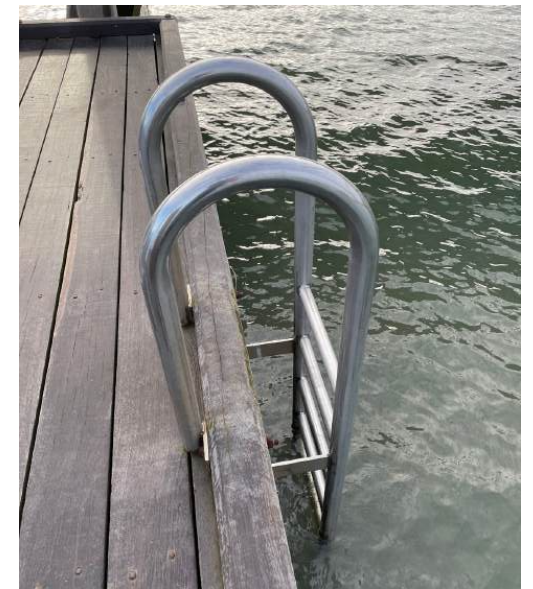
Detail view of swimming ladder to lower platform, Busselton Jetty. H+H Architects, 2022.
